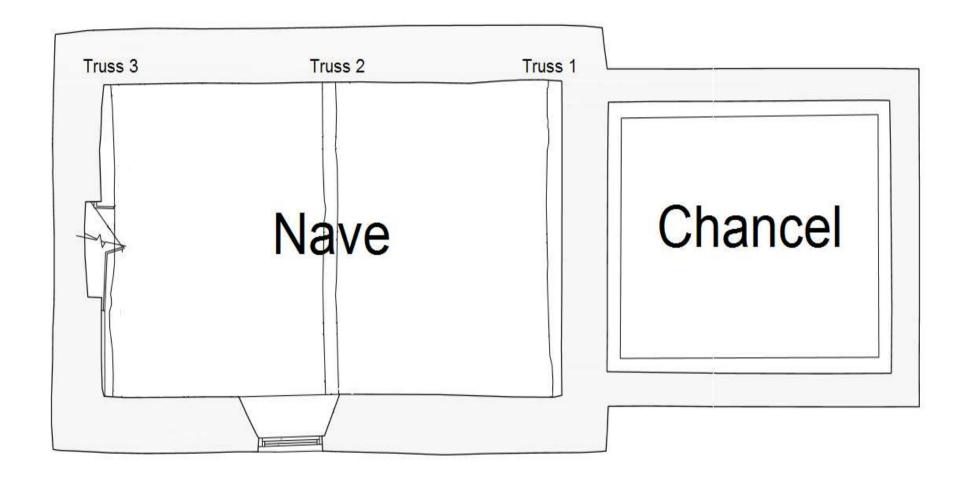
Plan of the church with truss positions marked (after Donald Insall Associates)
